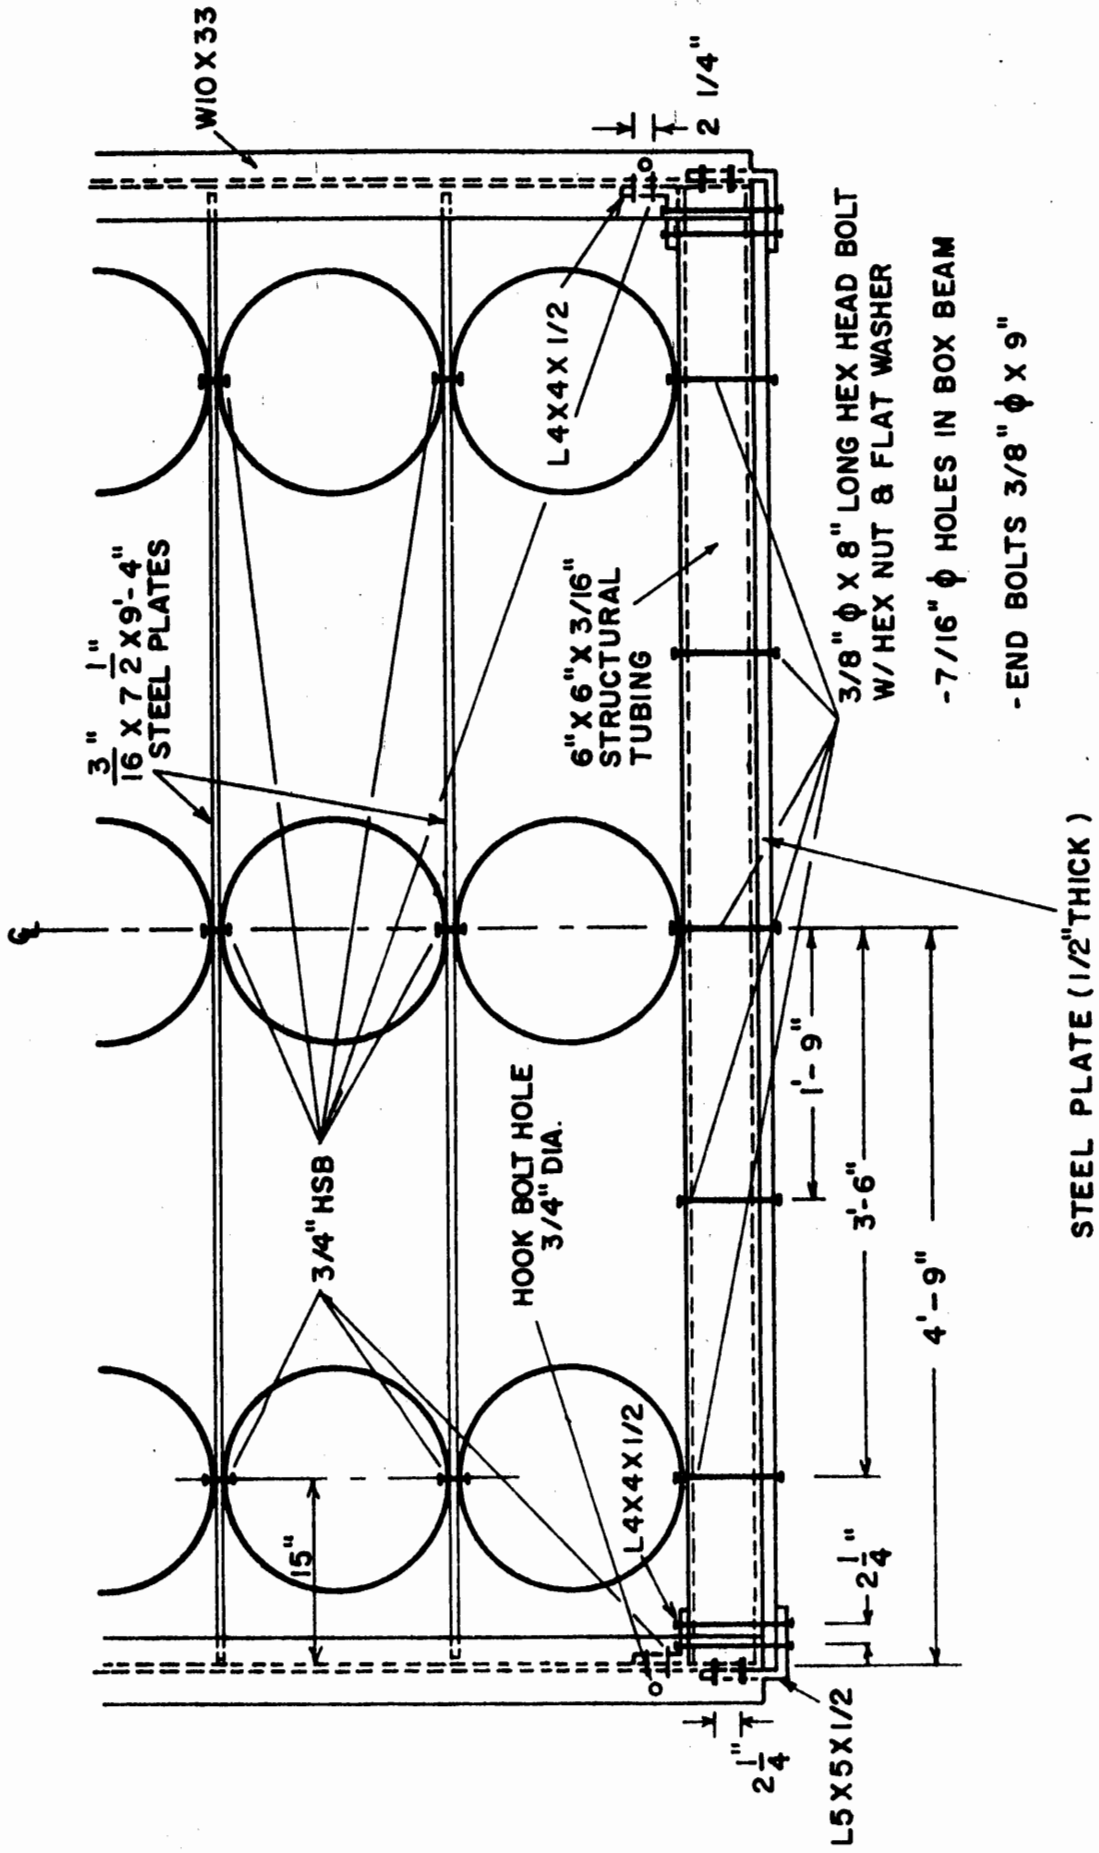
TOP VIEW OF REAR SEGMENT ( HSB HOLES DRILLED TO 13/16" DIA. )
